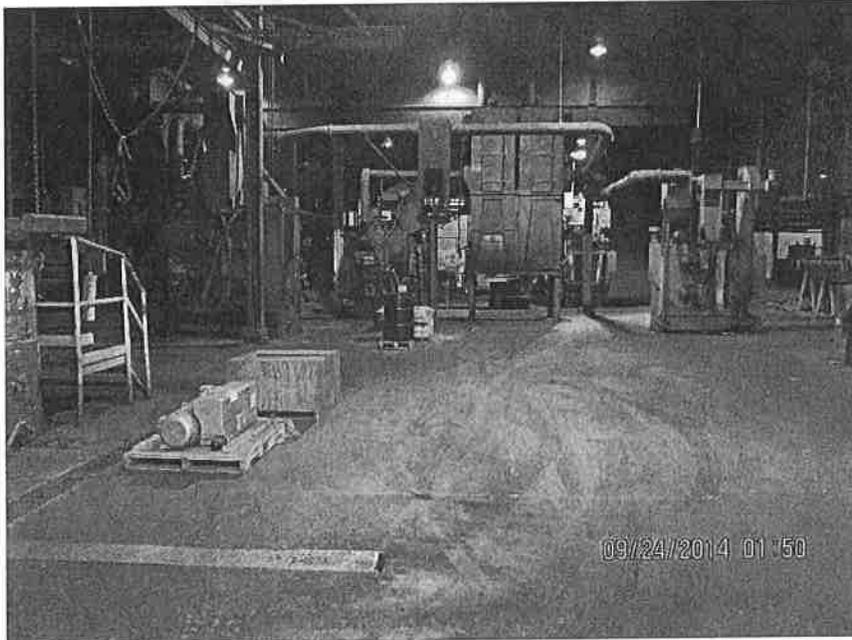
Typical building floor slab in south building. View to west; photograph taken on September 24, 2014.
